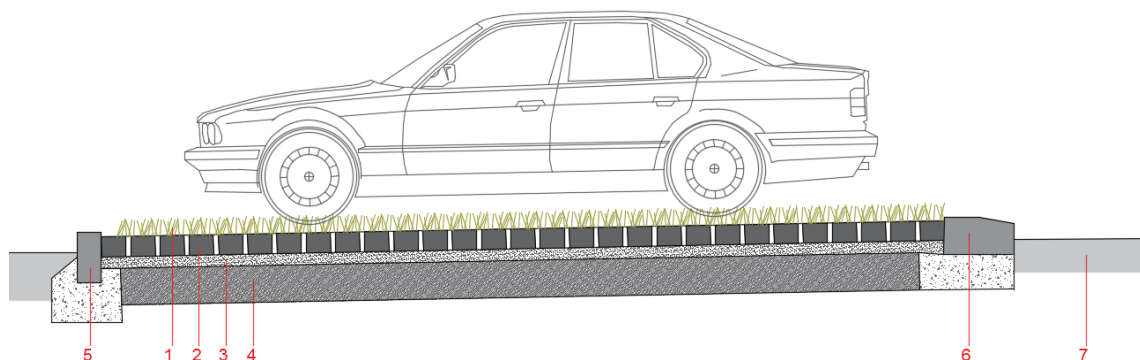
Technical section of the green parking pavement (Source: Valladolid City Council).
